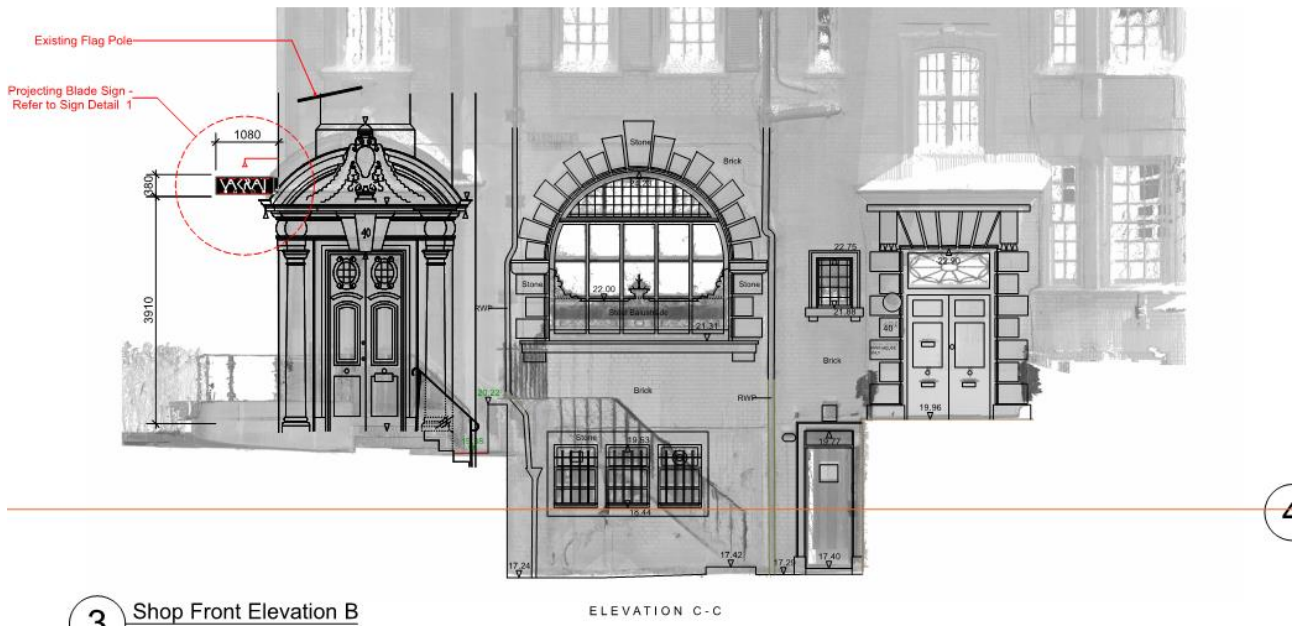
(above): Proposed shop front elevation B (source: submitted drawings)
